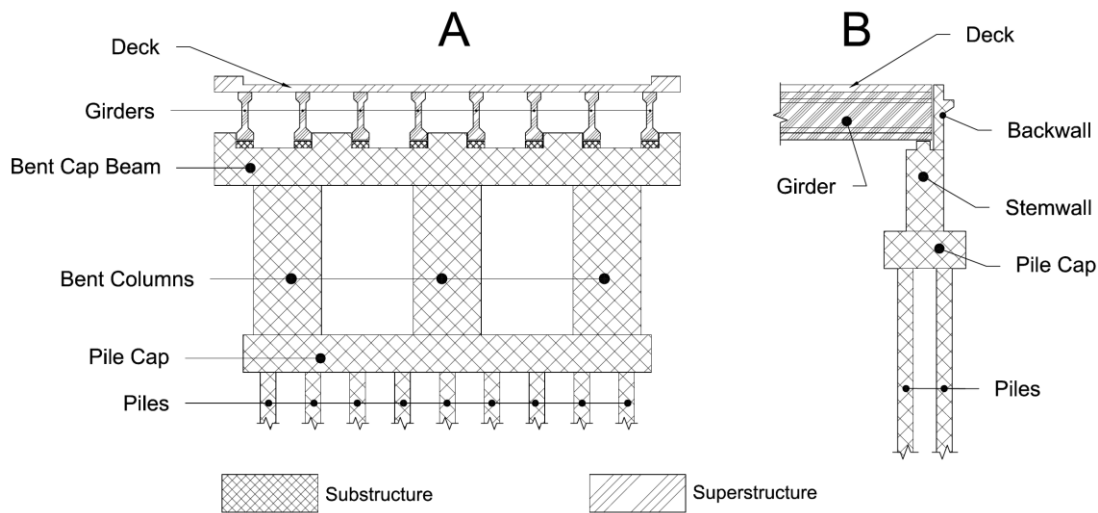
Superstructure and substructure at A) Bent location B) Abutment location.
